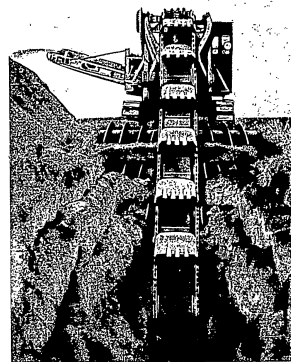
Model ЭТУ-353 Excavator equipped with auger reamers when digging trench in sand with stopped walls 3500 mm deep and 3200 mm wide along surface
